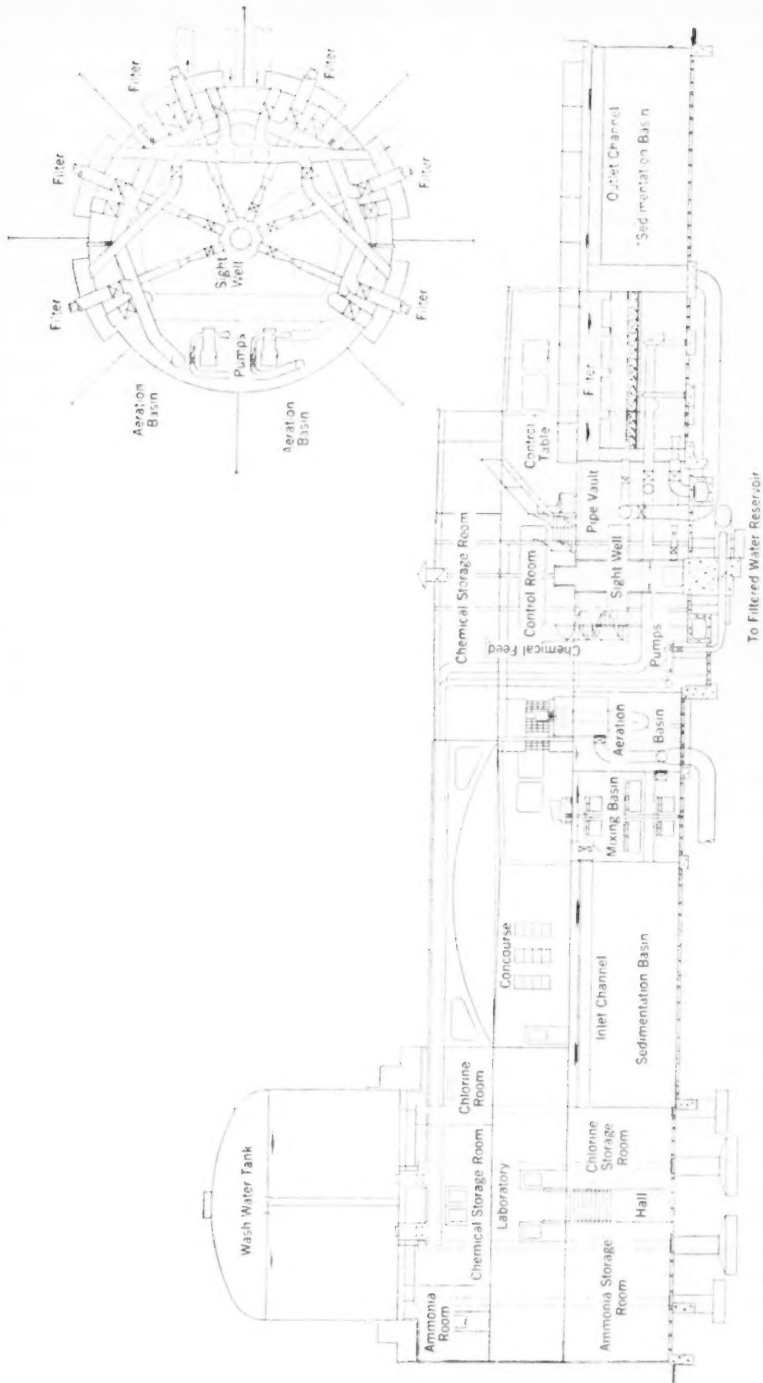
Section and Pipe Vault Plan of Willis School Water Filtration Plant
